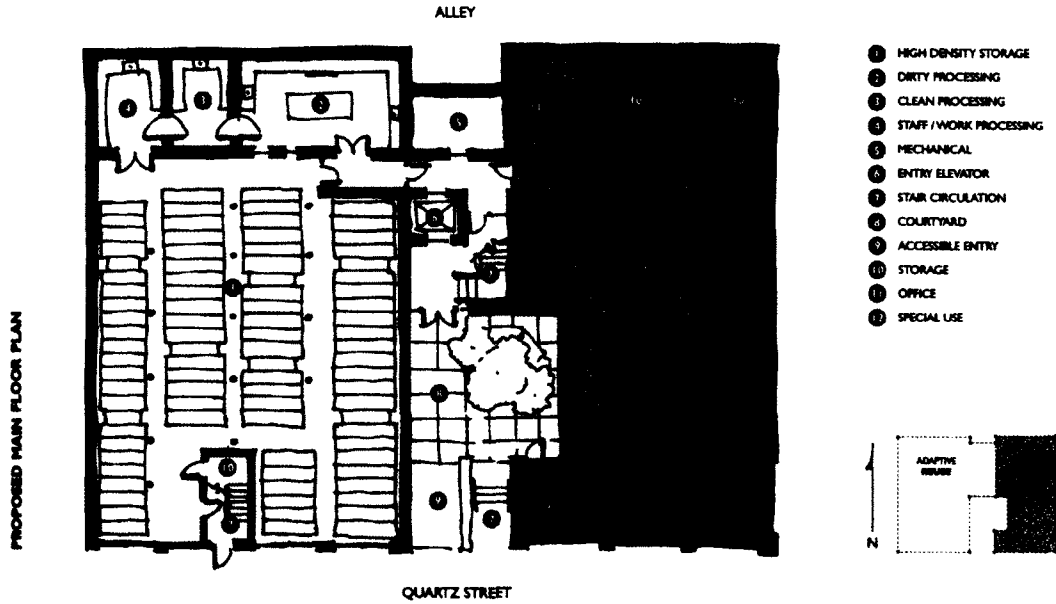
Proposed First Floor Plan. Courtesy of Butte-Silver Bow Archives.
